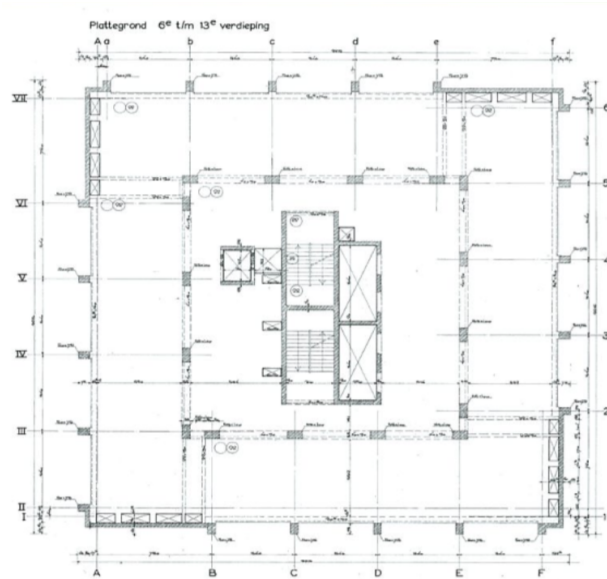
Westerlaantoren - Typical structural floor plan of existing building from the 6th up to the 13th level.
